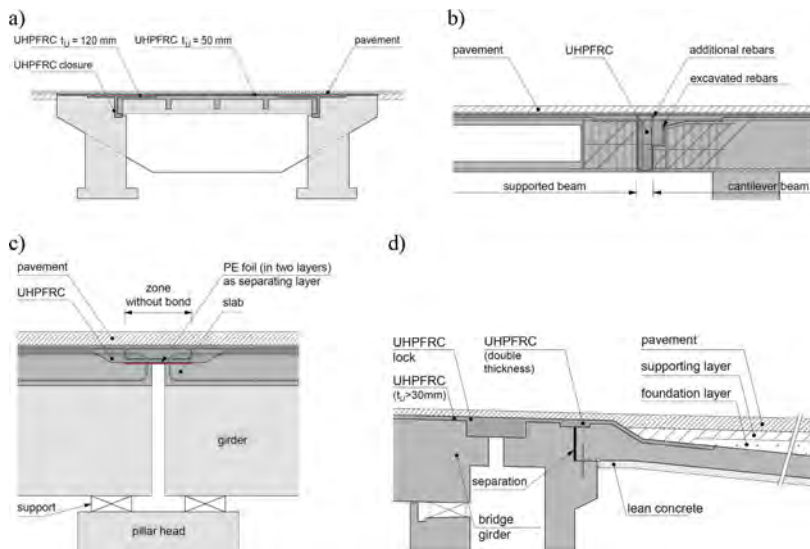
Principle of UHPFRC joint closure: a) in the abutment zones of a single span bridge to create a half-frame, b) force-locked Gerber joint, c) partial joint closure for beam chains, also called “link slab”, and d) creation of a semi-integral bridge end.
